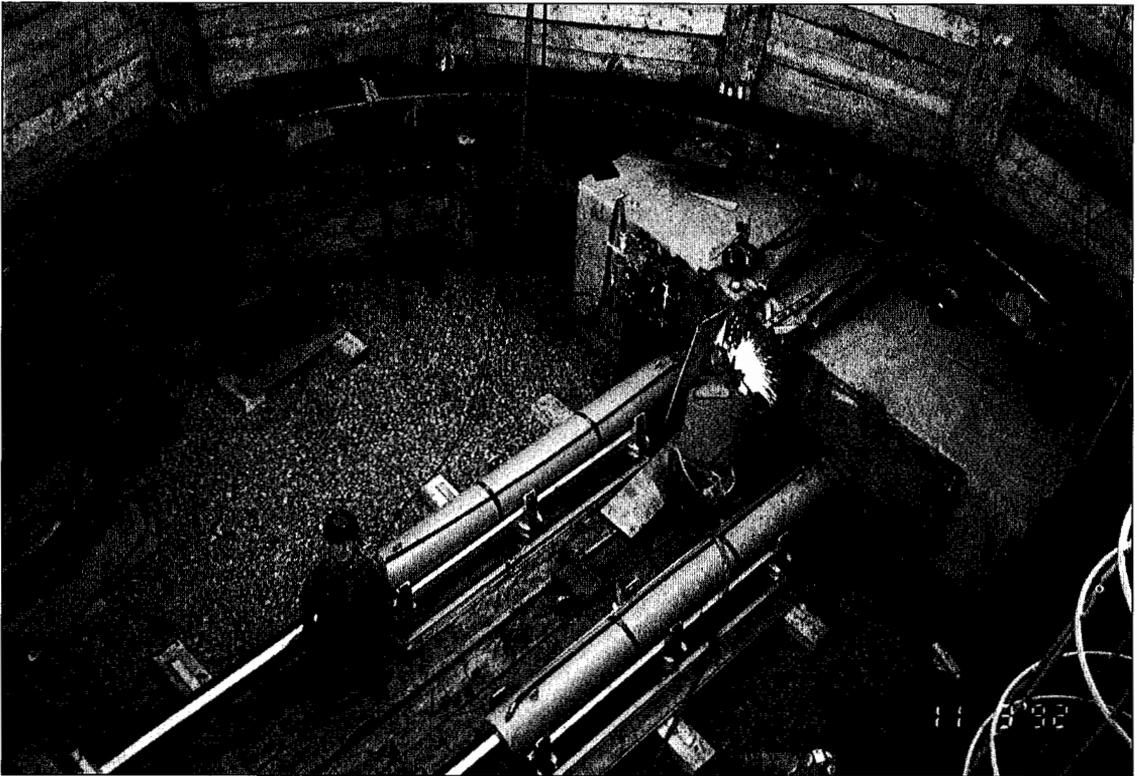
Circular jacking pit showing the hydraulic jacks and the concrete reaction block.
